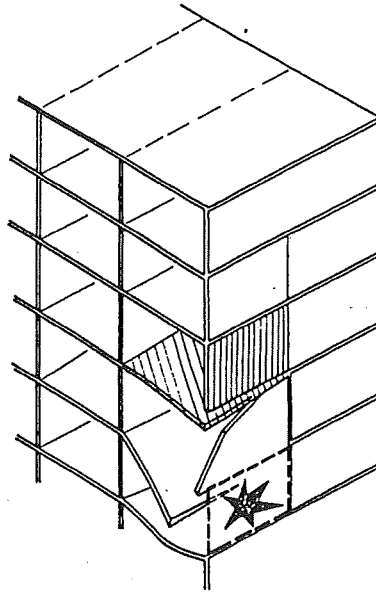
The wall structure is damaged by accidental loading. In order to prevent an extension of the damage and total collapse, the damaged structure must remain stable and an alternative load-bearing system must bridge over the damaged area. [Engström, 1992]
